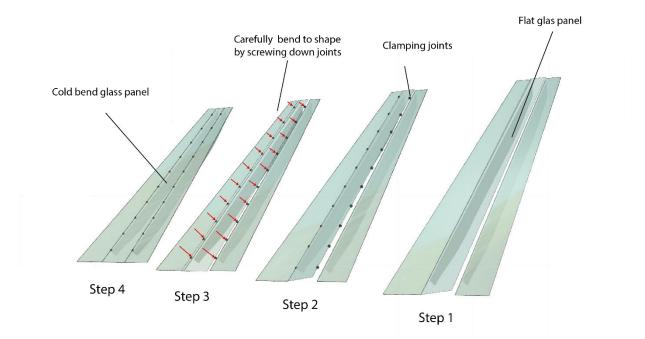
The cold bending process of a flat panel of glass. Source: own ill.
